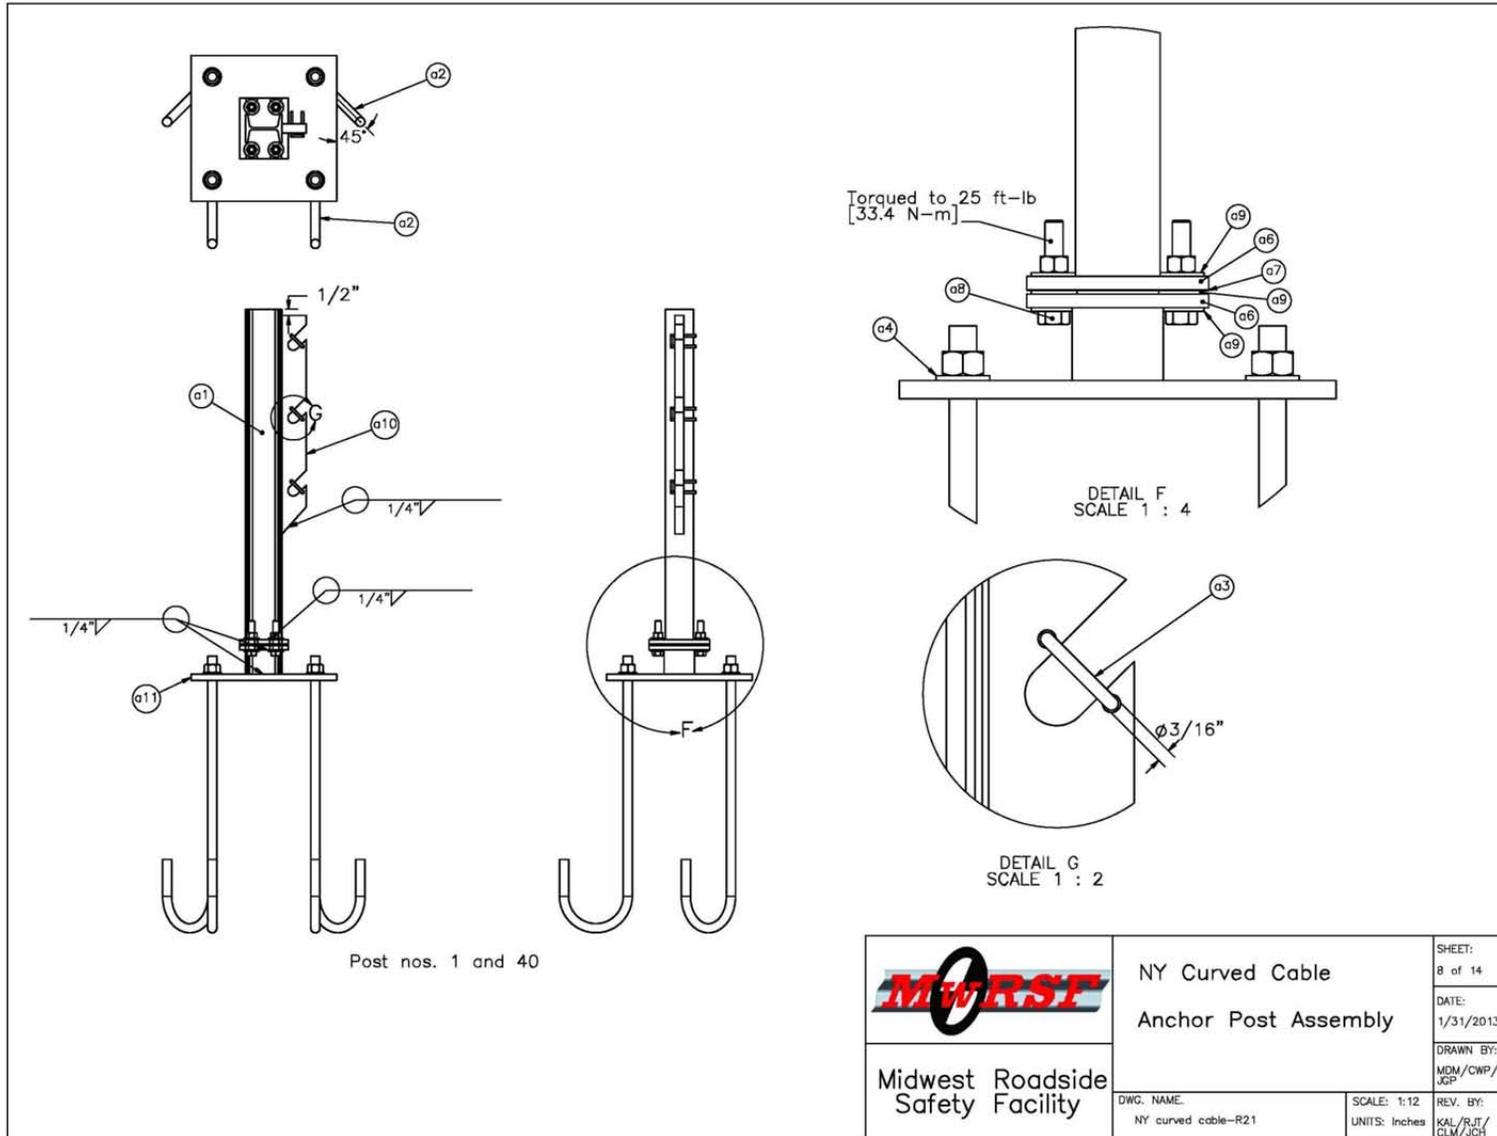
Anchor Post Assembly Details, Test No. NYCC-1
